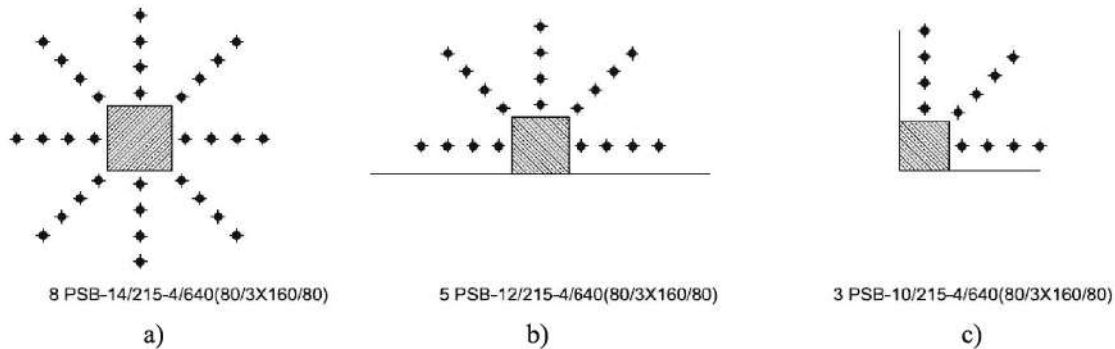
Shear reinforcement on the first floor (Peikko PSB): a) central column; b) edge column; c) corner column.
